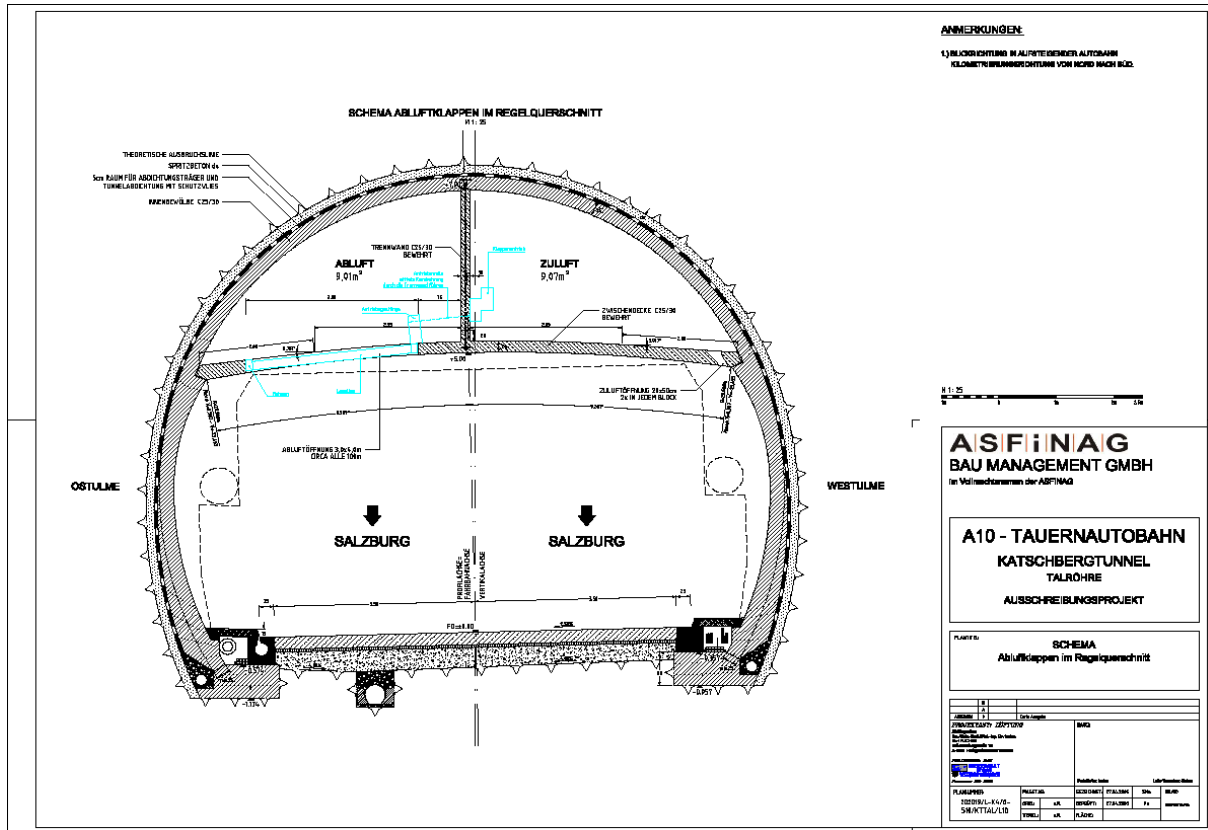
Cross section of the Katschbergtunnel and an adjustable smoke damper
